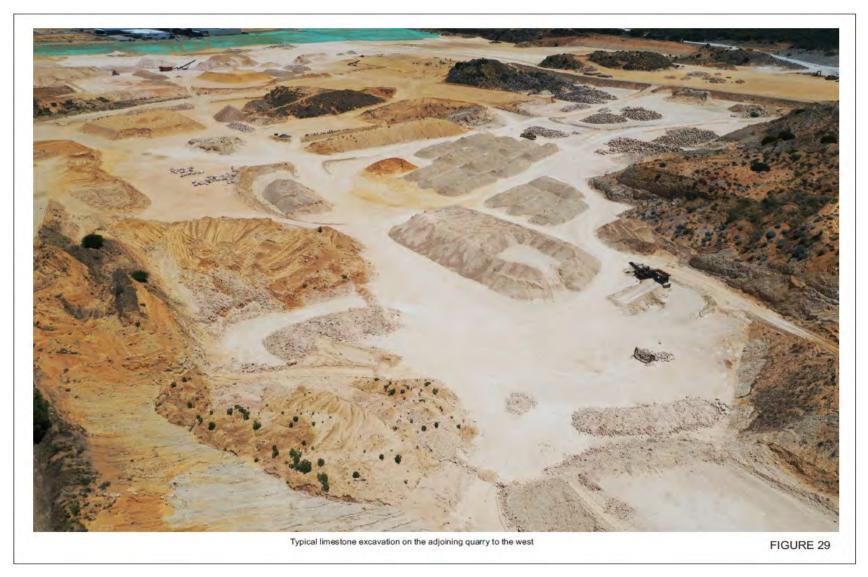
Typical limestone excavation on the adjoining quarry to the west
